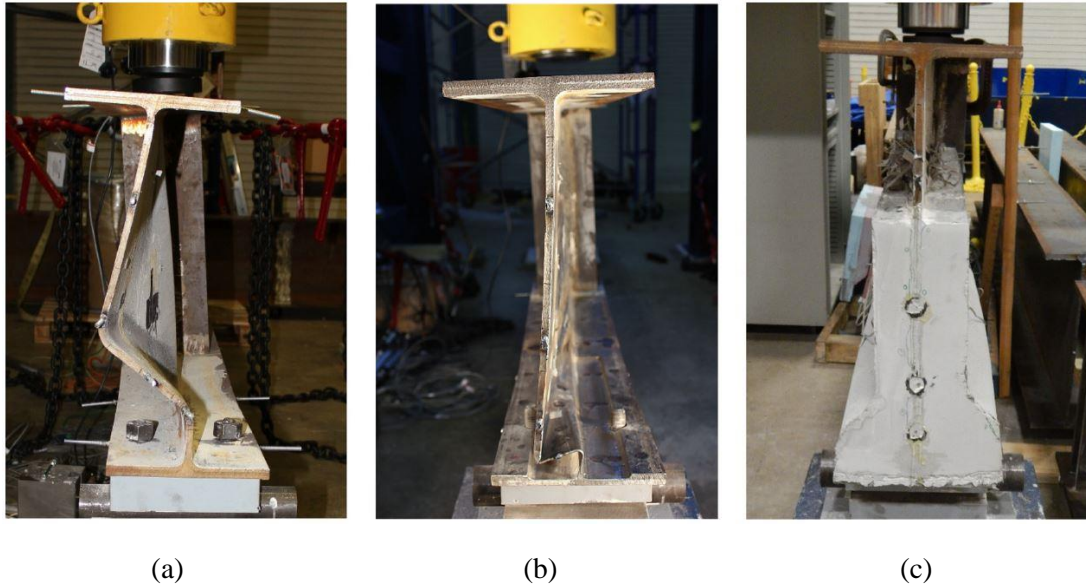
The final condition of the end cross-section after testing for the: (a) undamaged girder, (b) damaged girder, and (c) repaired girder (Zmetra, 2017)
